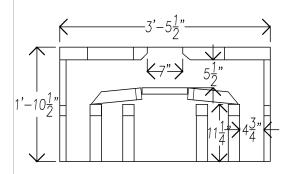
the 3 bake oven slabs and the 2 piece ceiling slab
